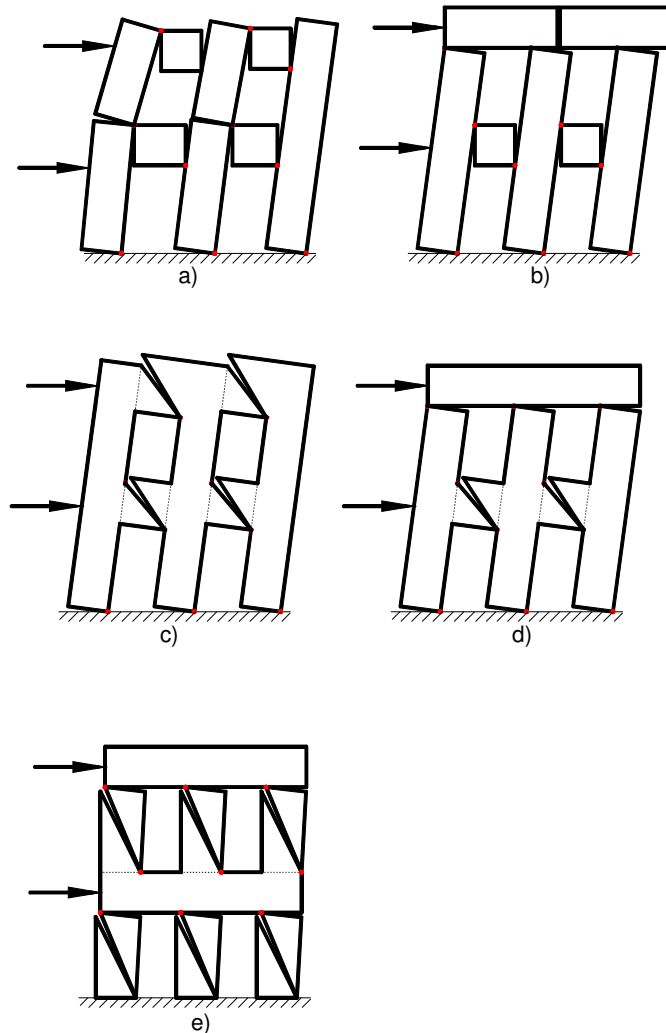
Typical in-plane failure modes for a masonry façade
